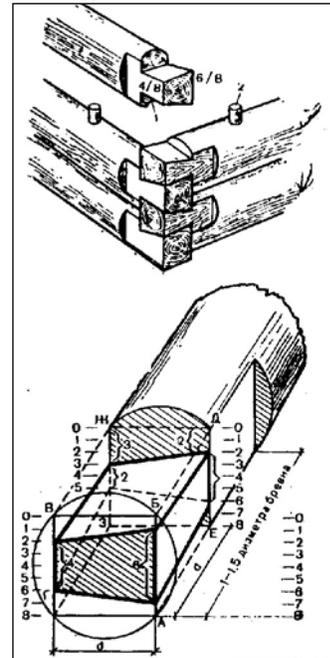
Detail of wood connections in log house construction (WHE Report 56)
